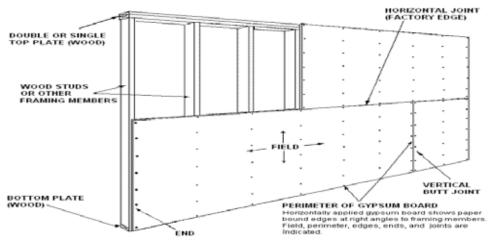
Horizontally Applied Gypsum Wallboard Showing Joints and Framing
